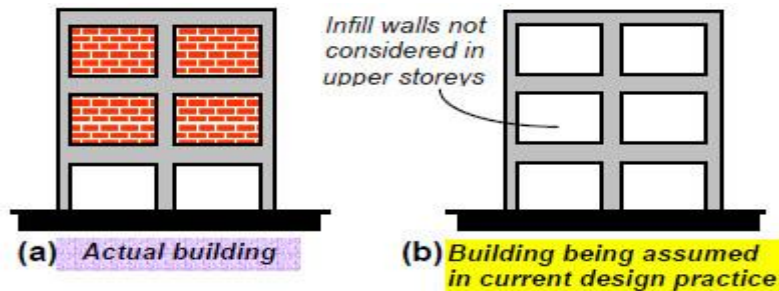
Open ground storey building – assumptions made in current design practice are not consistent with the actual structure.
